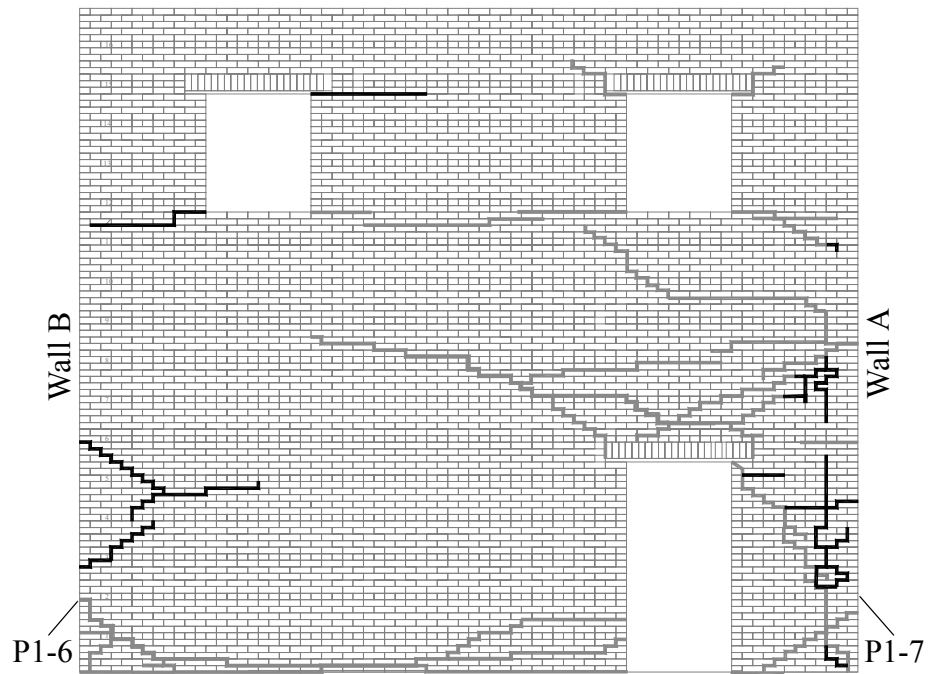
Crack pattern in Wall 1 following Test Run 39.
